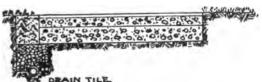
Drainage of Foundation by Use of Ditch and Tile Drain.
